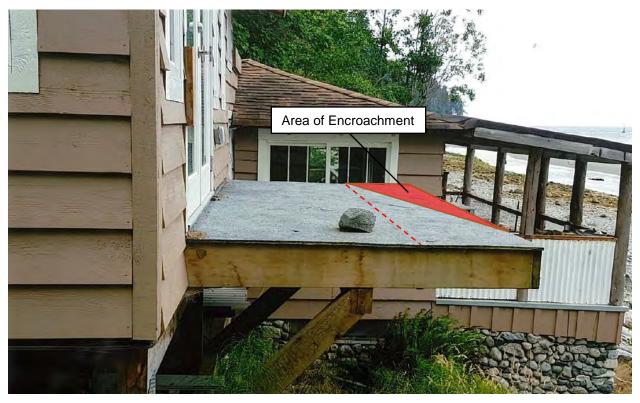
Area of deck encroaching into natural boundary setback (approximation). Existing legally non-conforming deck in background.
